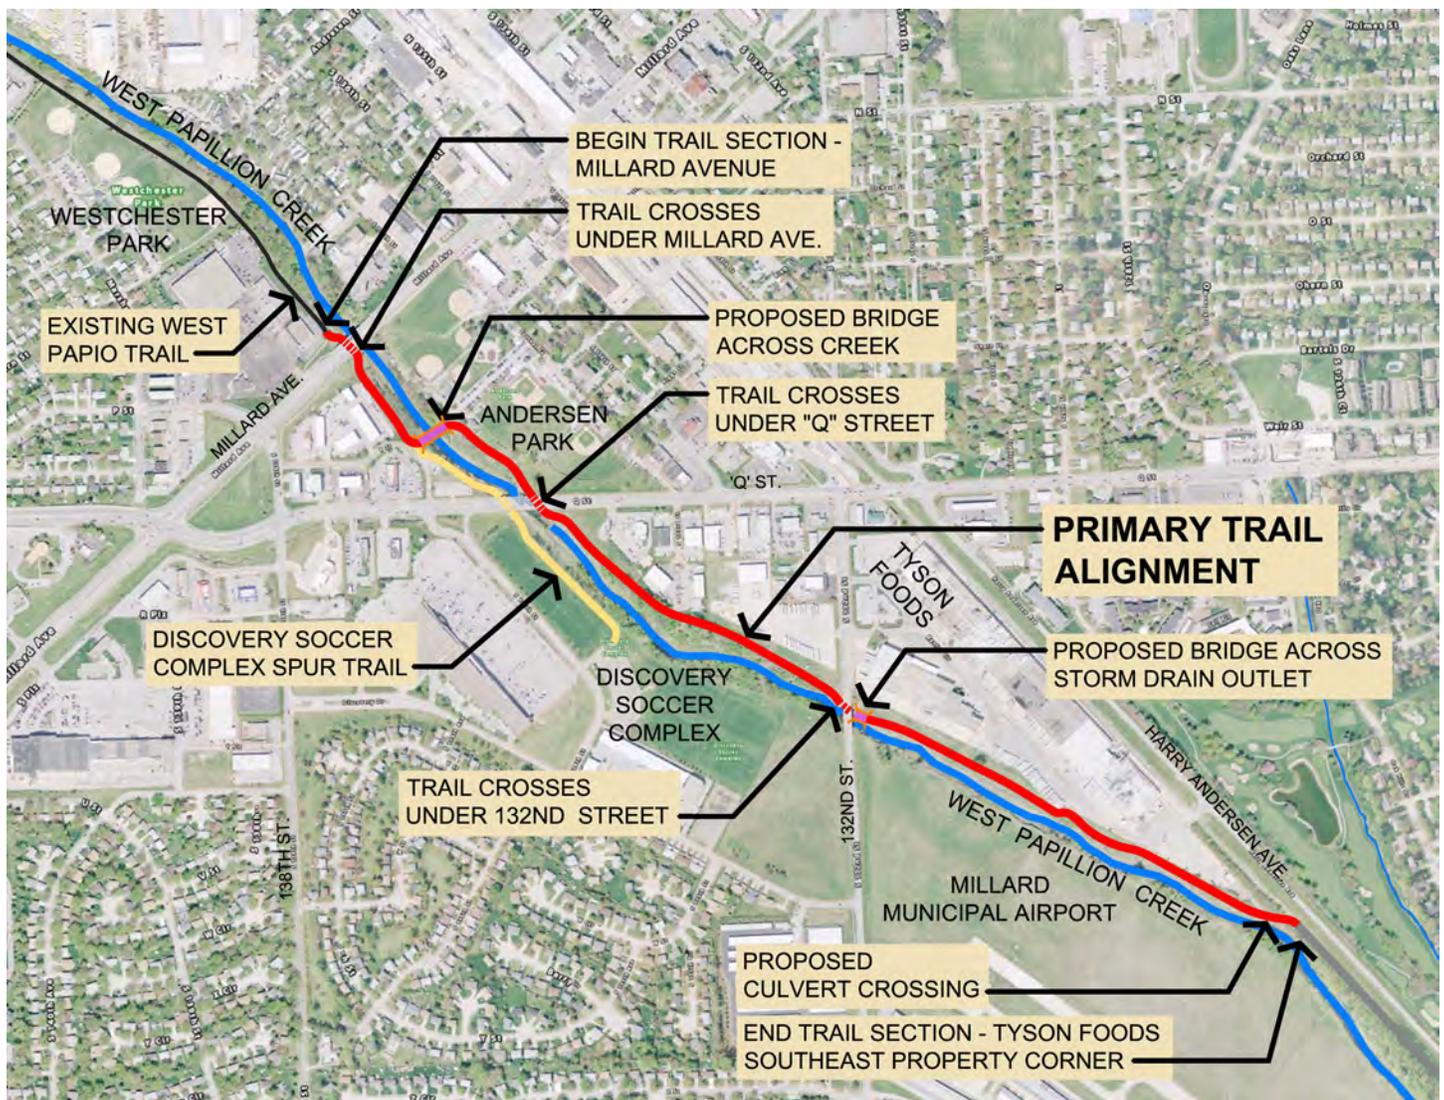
Millard Avenue to Southeast Property Corner of Tyson Foods, Primary Alignment
